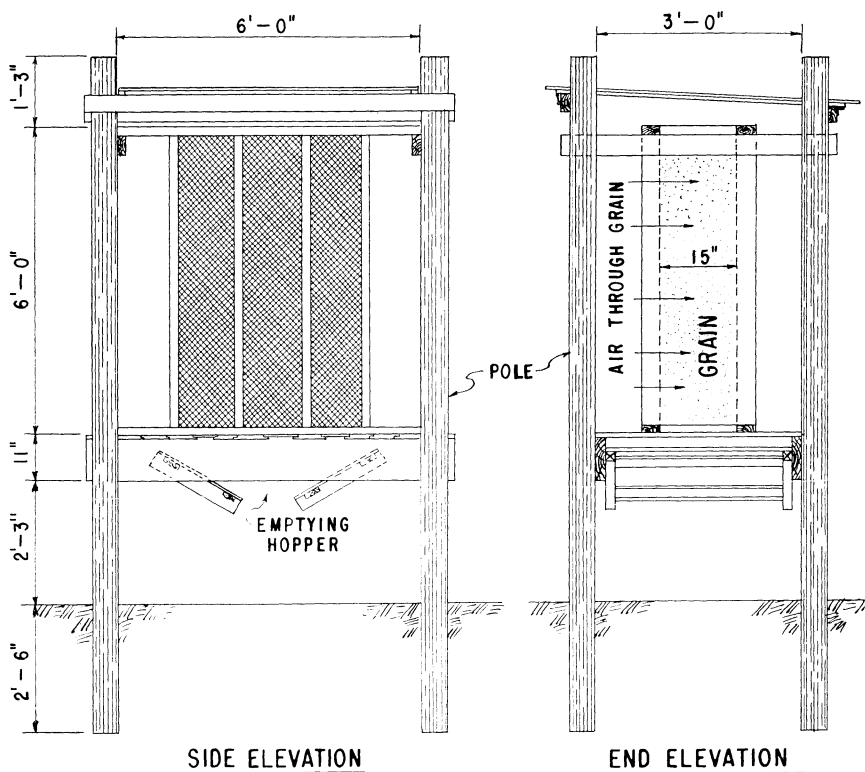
Construction details of wind ventilated column driers for grain. All walls were free standing so wall spacing and bin capacity could be varied.
